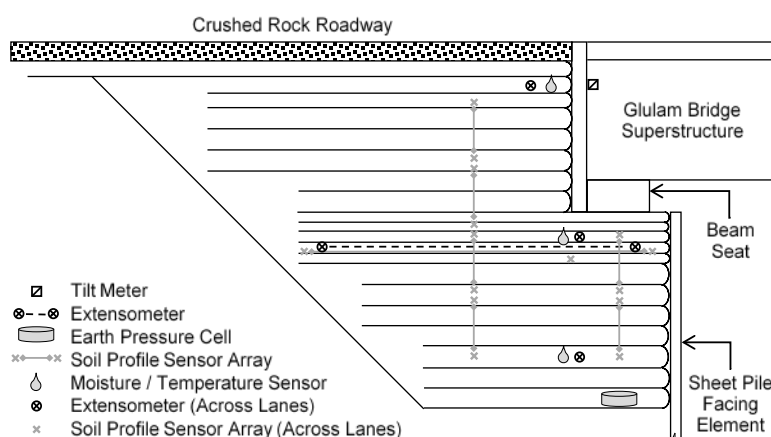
Sensor placement within GRS abutment. Adapted from site design plans prepared by Buchanan County, Iowa, and used with permission
